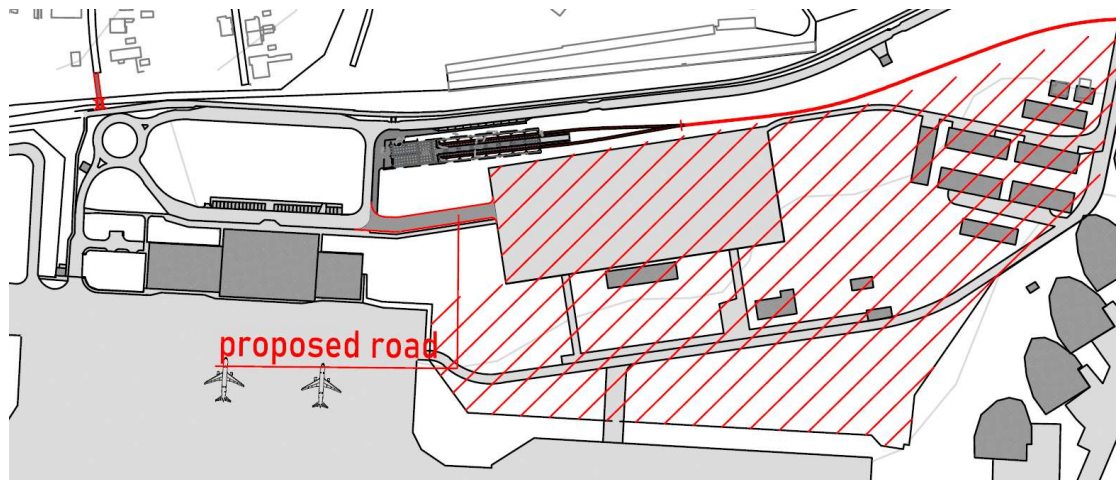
graphic depiction showing what parts of the civil airport terminal would be connected by the road without the need to use a railway crossing.
